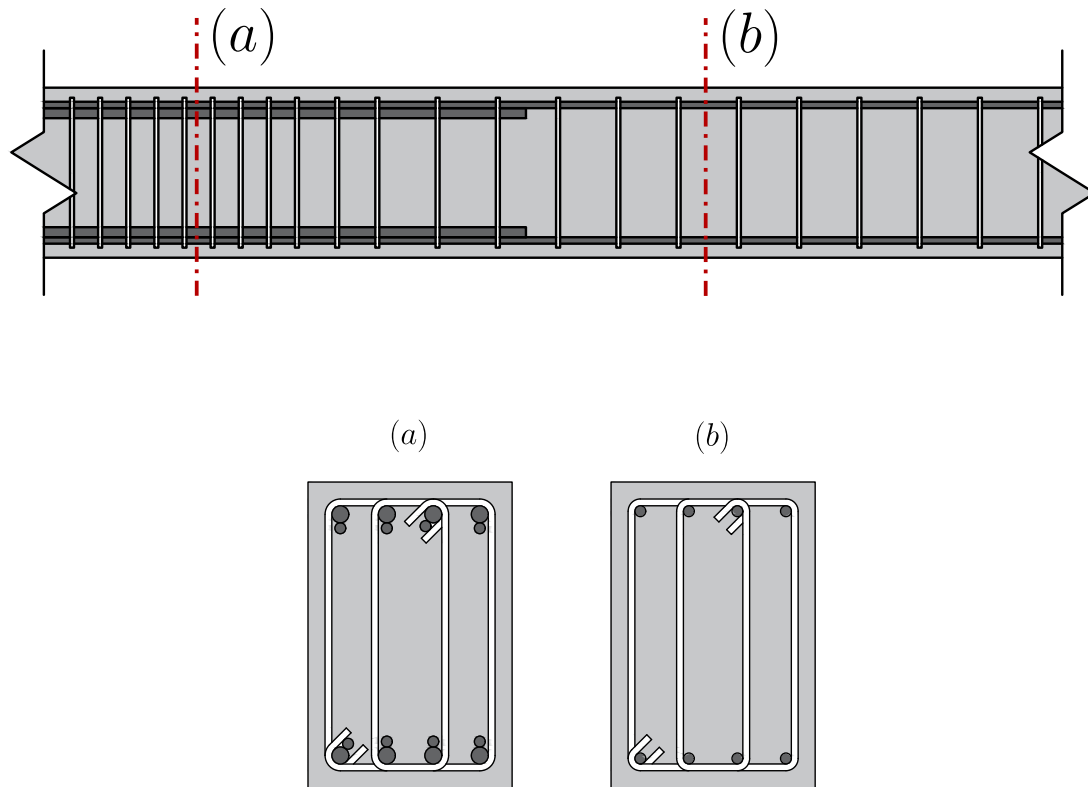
Reinforcement detailing for the critical beam ( $30 \times 45 \text{ cm}^2$ ). The support section is heavily reinforced with 4HA25 + 4HA16 at both the top and bottom. At midspan, the primary bottom reinforcement consists of 4HA16. Transverse reinforcement comprises 2 Ø10 stirrups (cadrés).
